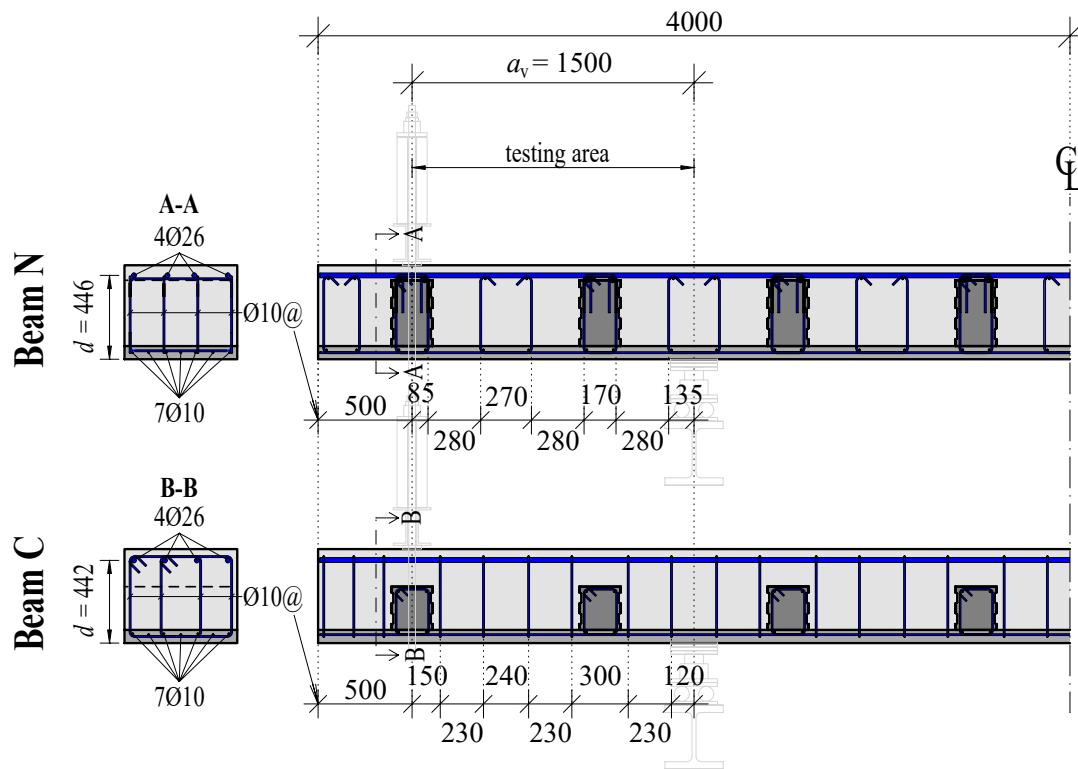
Reinforcement layout for the beams N and C (all dimensions in mm).
